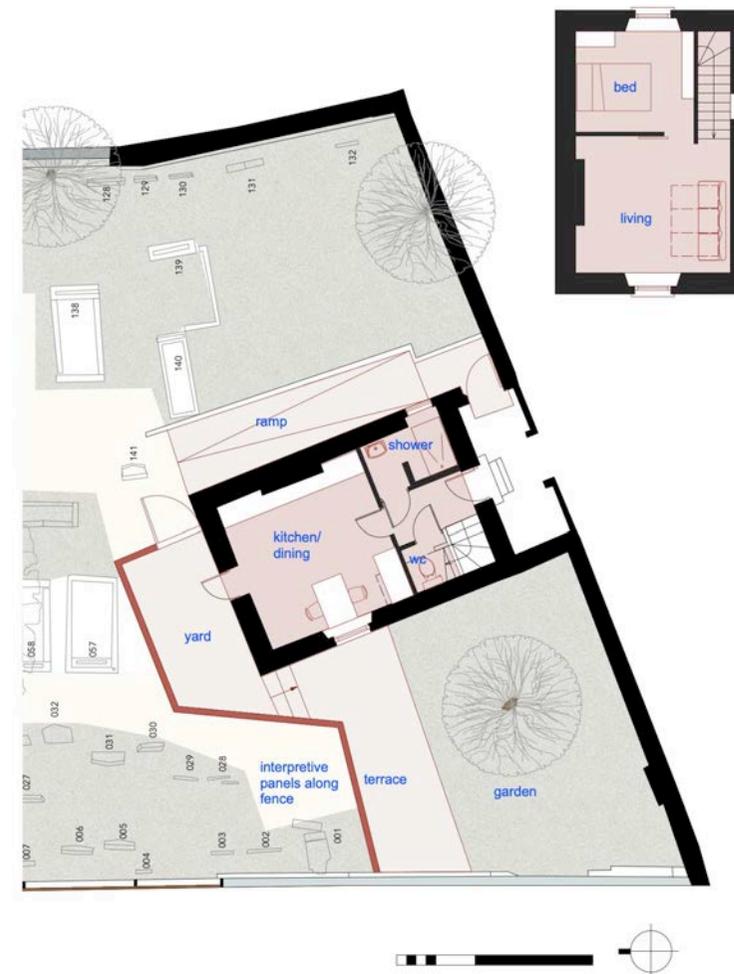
Outline plan showing refurbished mortuary house and private garden with ramped access and interpretative panels.
